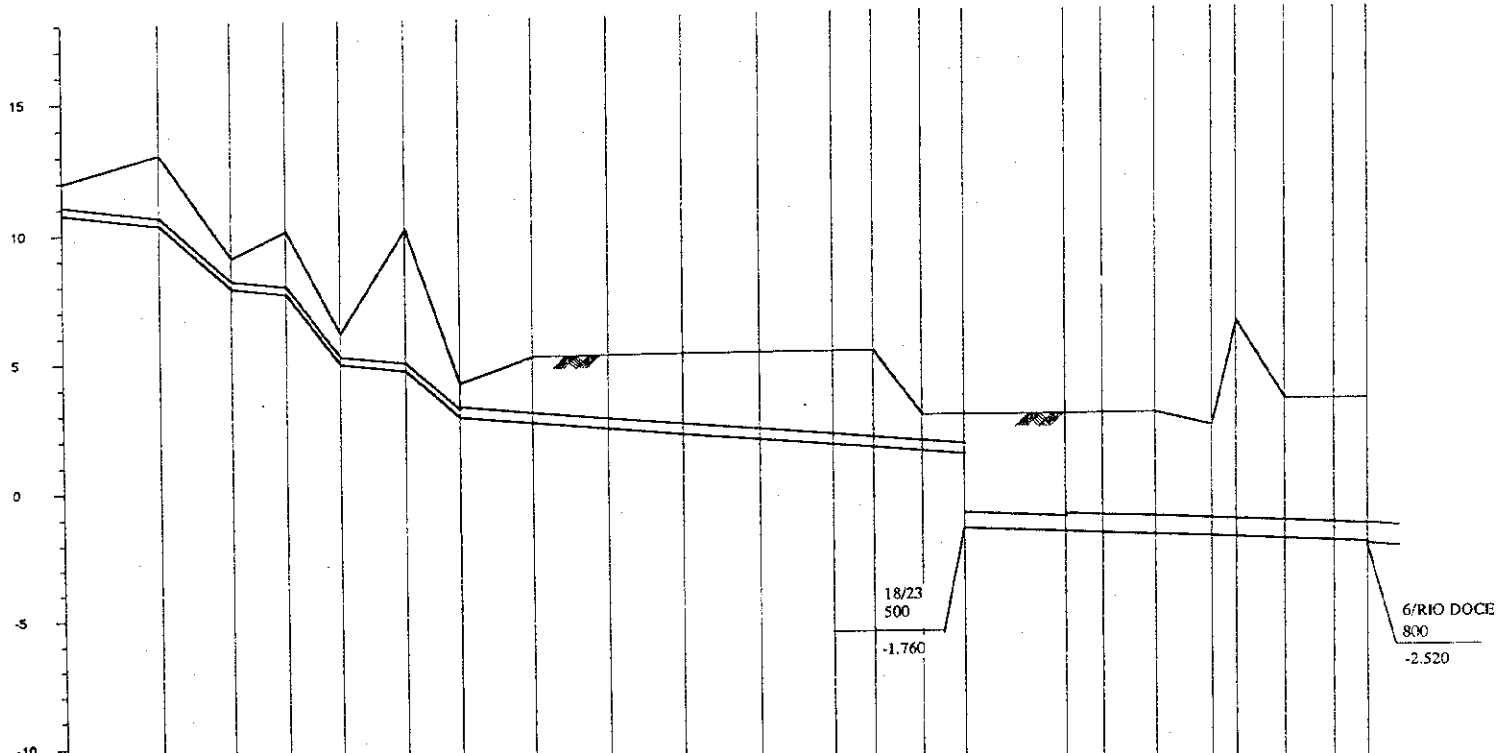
Longitudinal Profile of Proposed Sewer to Janga 1-3
